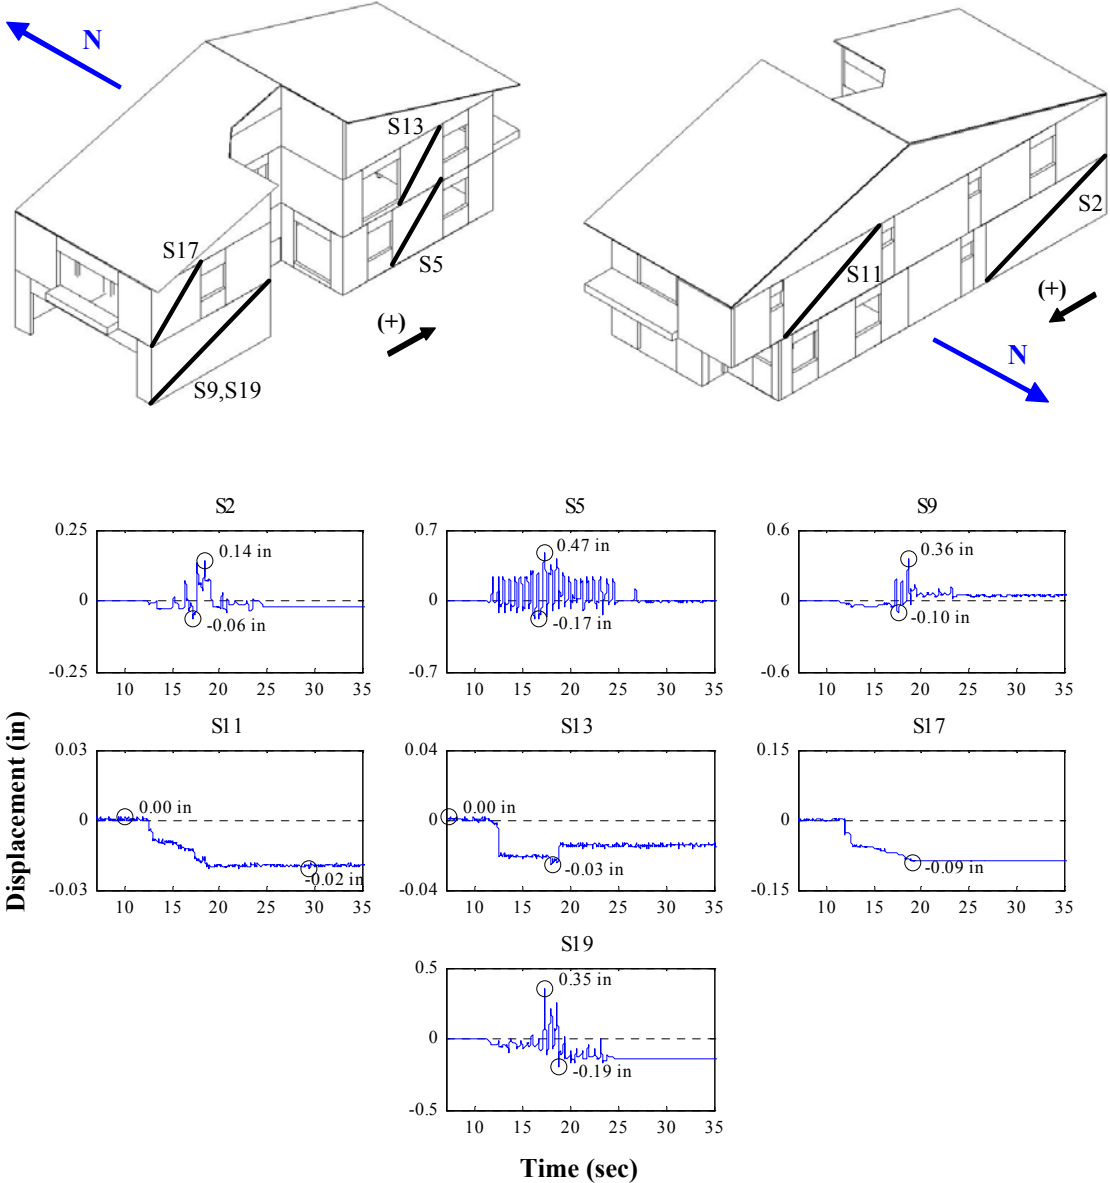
Wall deformations of east-west external walls for Test NWP5S08
